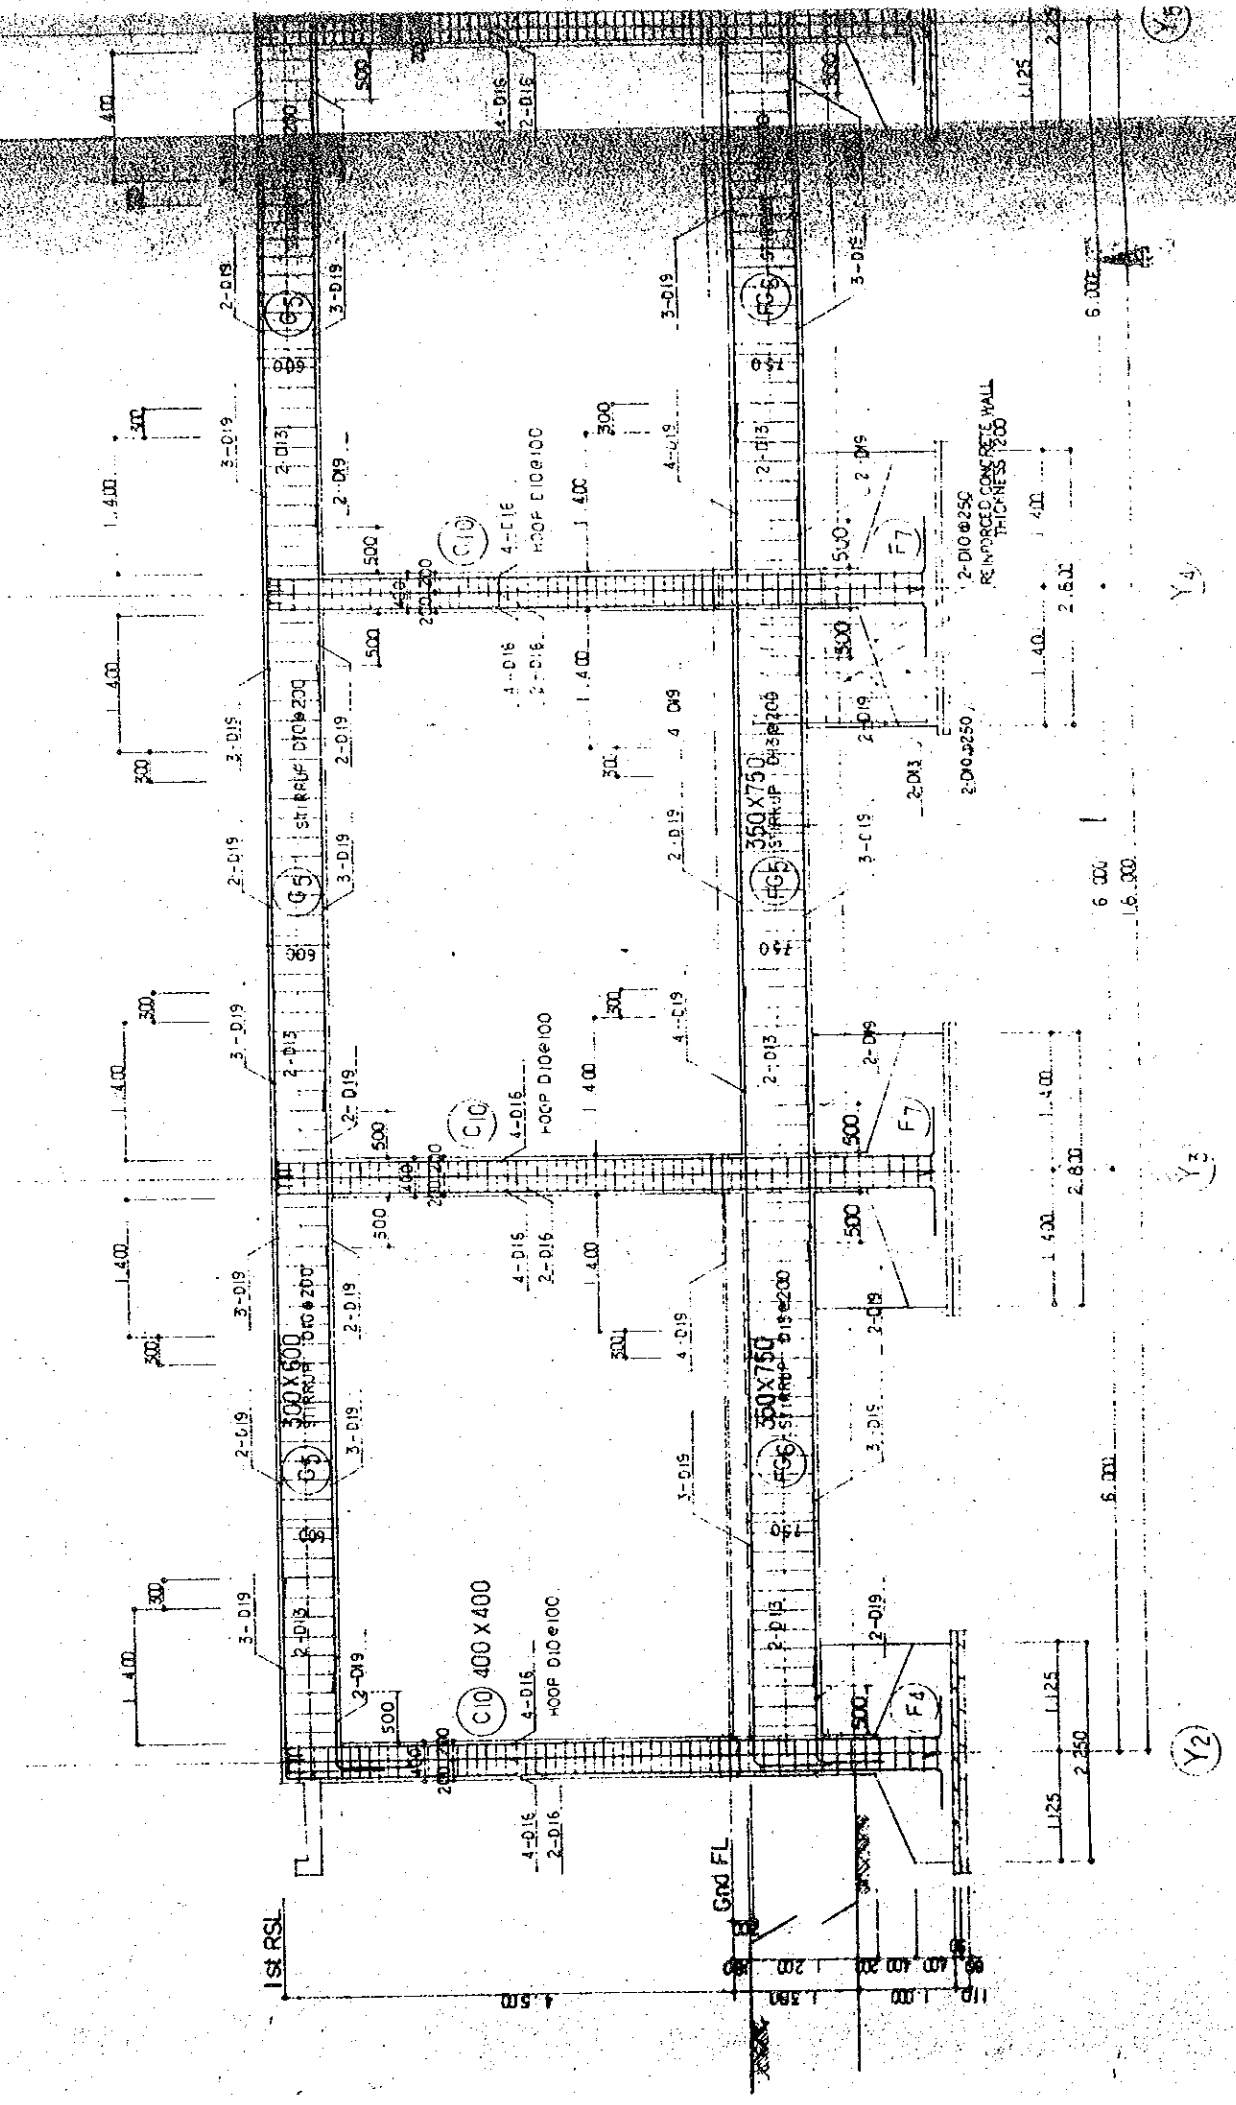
DETAIL OF WATER TANK FOR ENGINE DUMMY S-1/50
